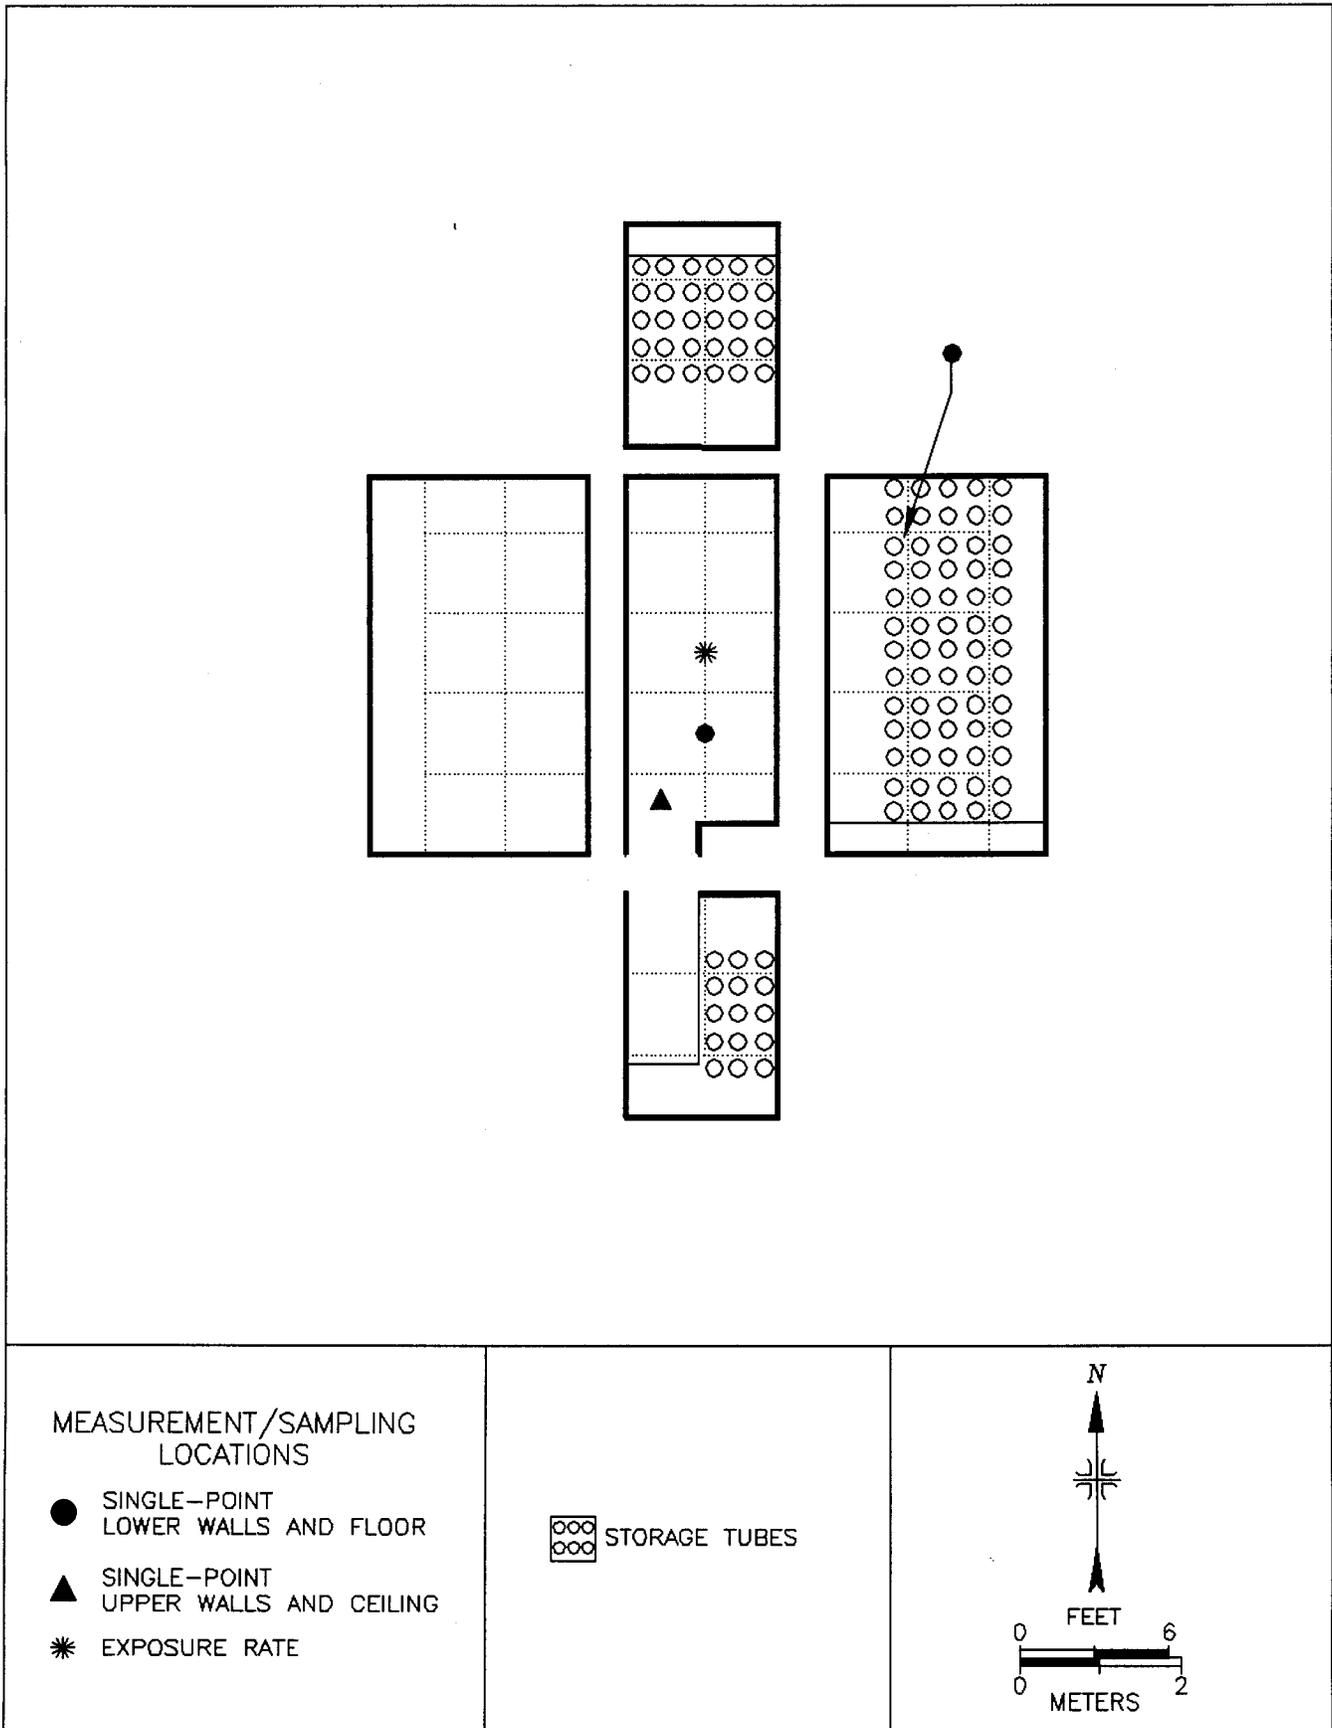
Building T012, Room 109, Fuel Storage Cell - Measurement and Sampling Locations
